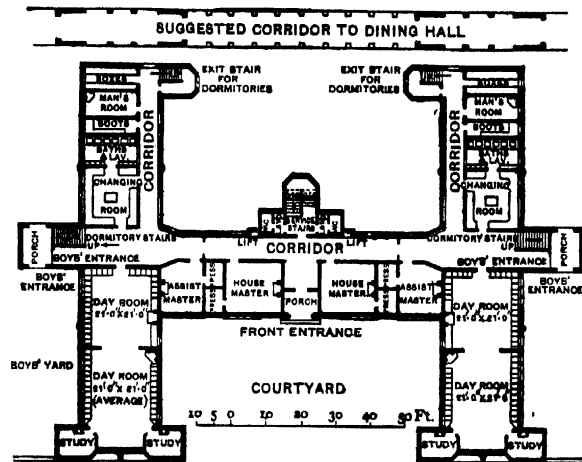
Plan of a Master's House, New Christ's Hospital. (Webb and Bell.)
